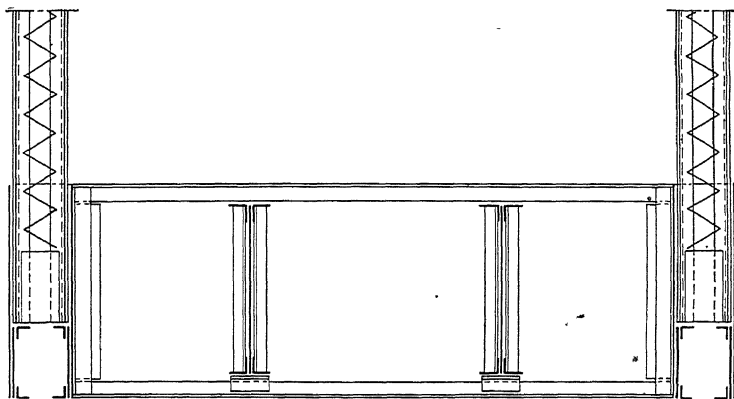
Cross-Section of Typical Single-Track Through Truss Bridge.
